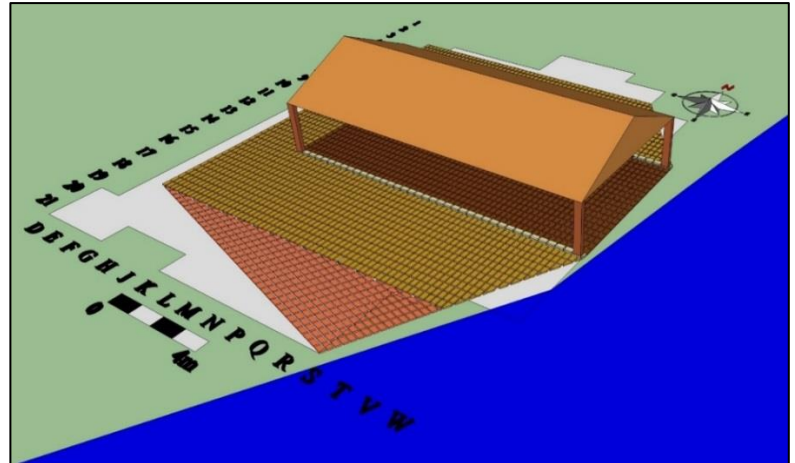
The proposed reconstruction architecture plan for the monument at the SB2J site is based on the findings of the floor structure, corridors, walls, staircase, roof tiles, and pillar base (Source: The authors)
